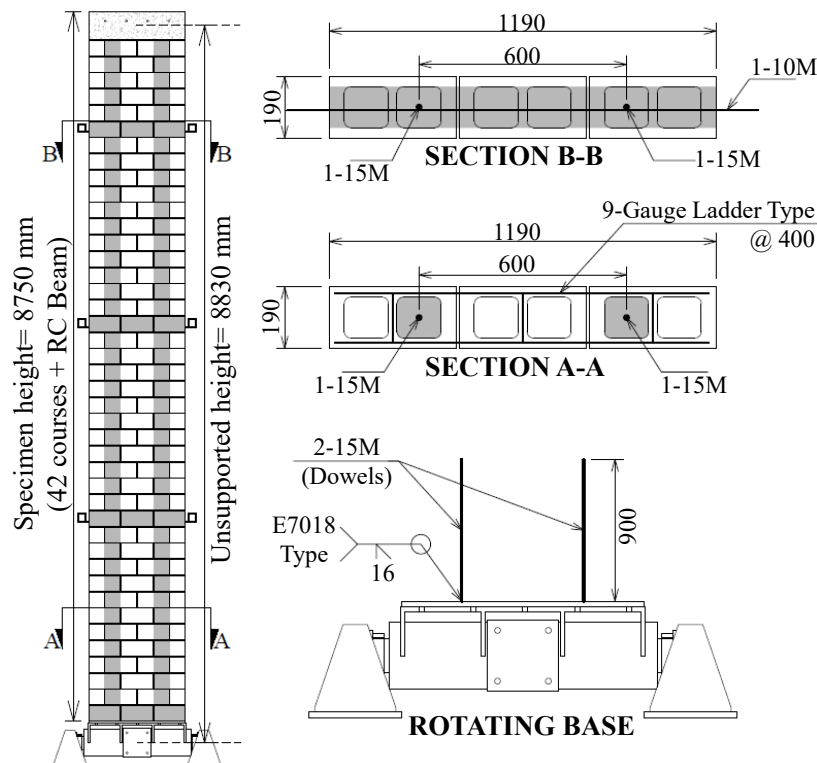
Specimens' geometry and reinforcement (units in mm)
